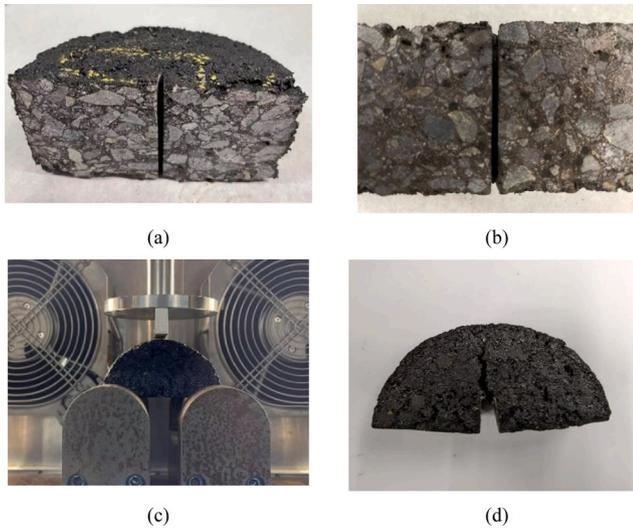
The SCB test specimen and setup: (a) SCB test specimen (top view), (b) SCB test specimen front view, (c) the SCB test setup and (d) a sample after testing.
